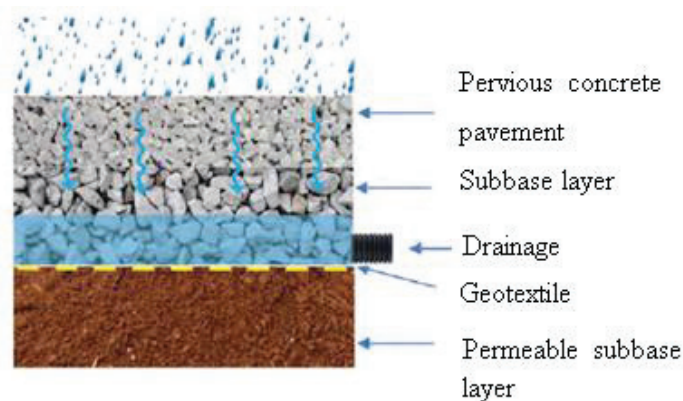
Pervious pavement structure with a drainage system (Source: [6])
